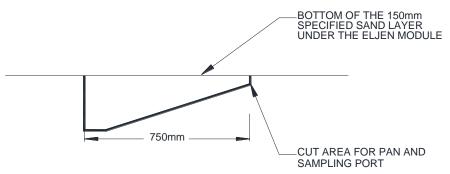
OBSERVATION AND SAMPLING PORT PREPARATION PLAN VIEW
